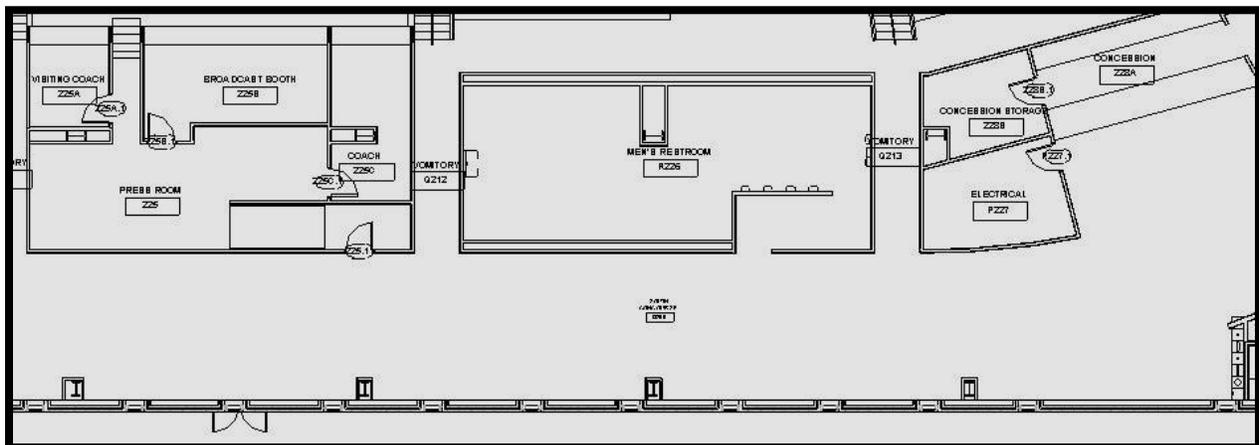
South Portion of the Existing Main Concourse Level Floor Plan
